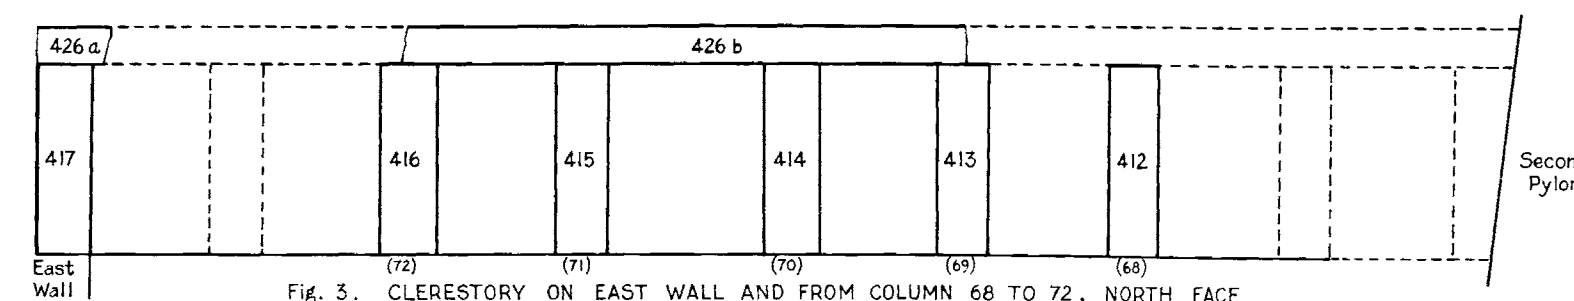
CLERESTORY ON EAST WALL AND FROM COLUMN 68 TO 72, NORTH FACE
